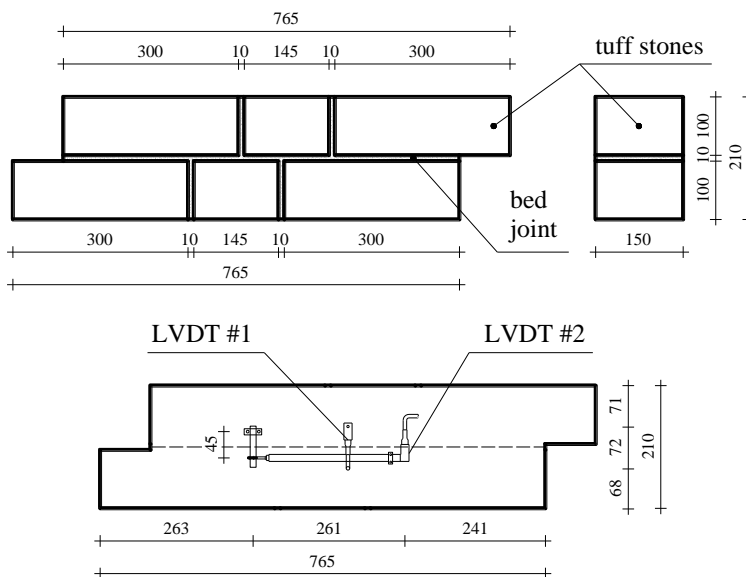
Specimen geometry (dimensions in mm) and arrangement of LVDTs
